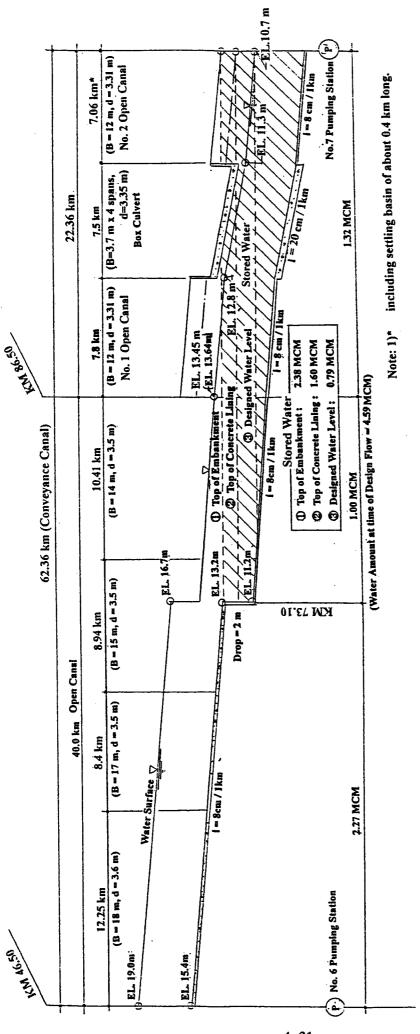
Profile of Conveyance Canal between No.6 and No.7 Pumping Stations
